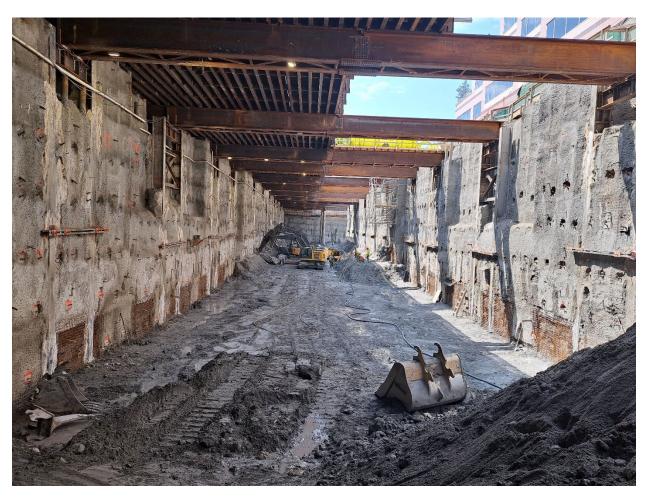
Arbutus Station: Progressing with the excavation of the station box under the traffic deck.
